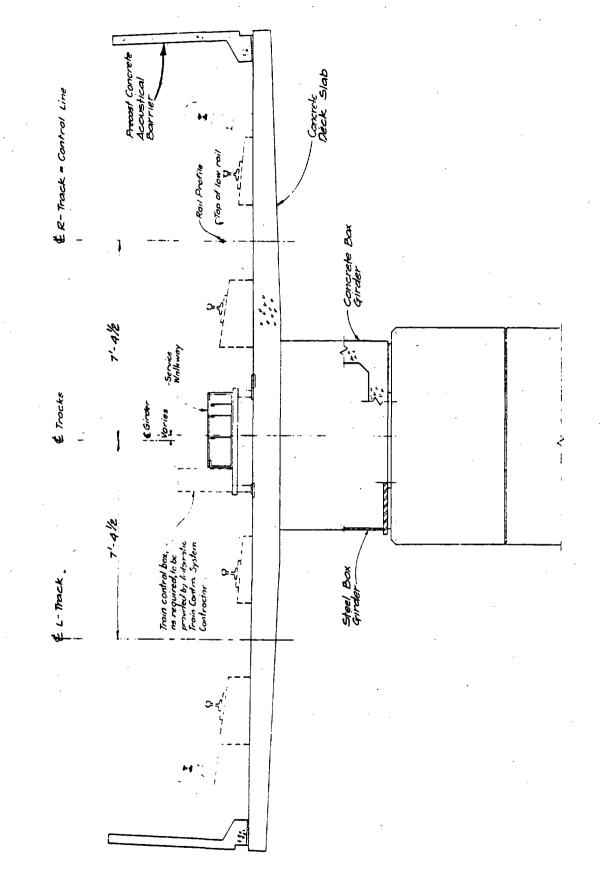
MARTA ELEVATED STRUCTURE TYPICAL SECTION
